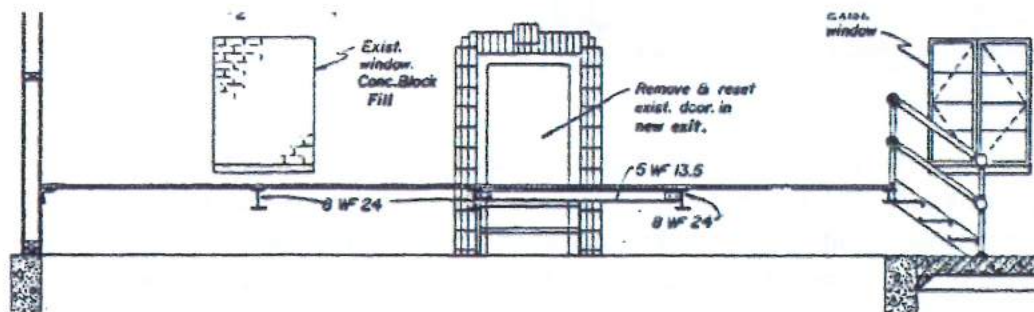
Steel Framed Floor with Grating at Northeast Addition (1950 Drawings)
